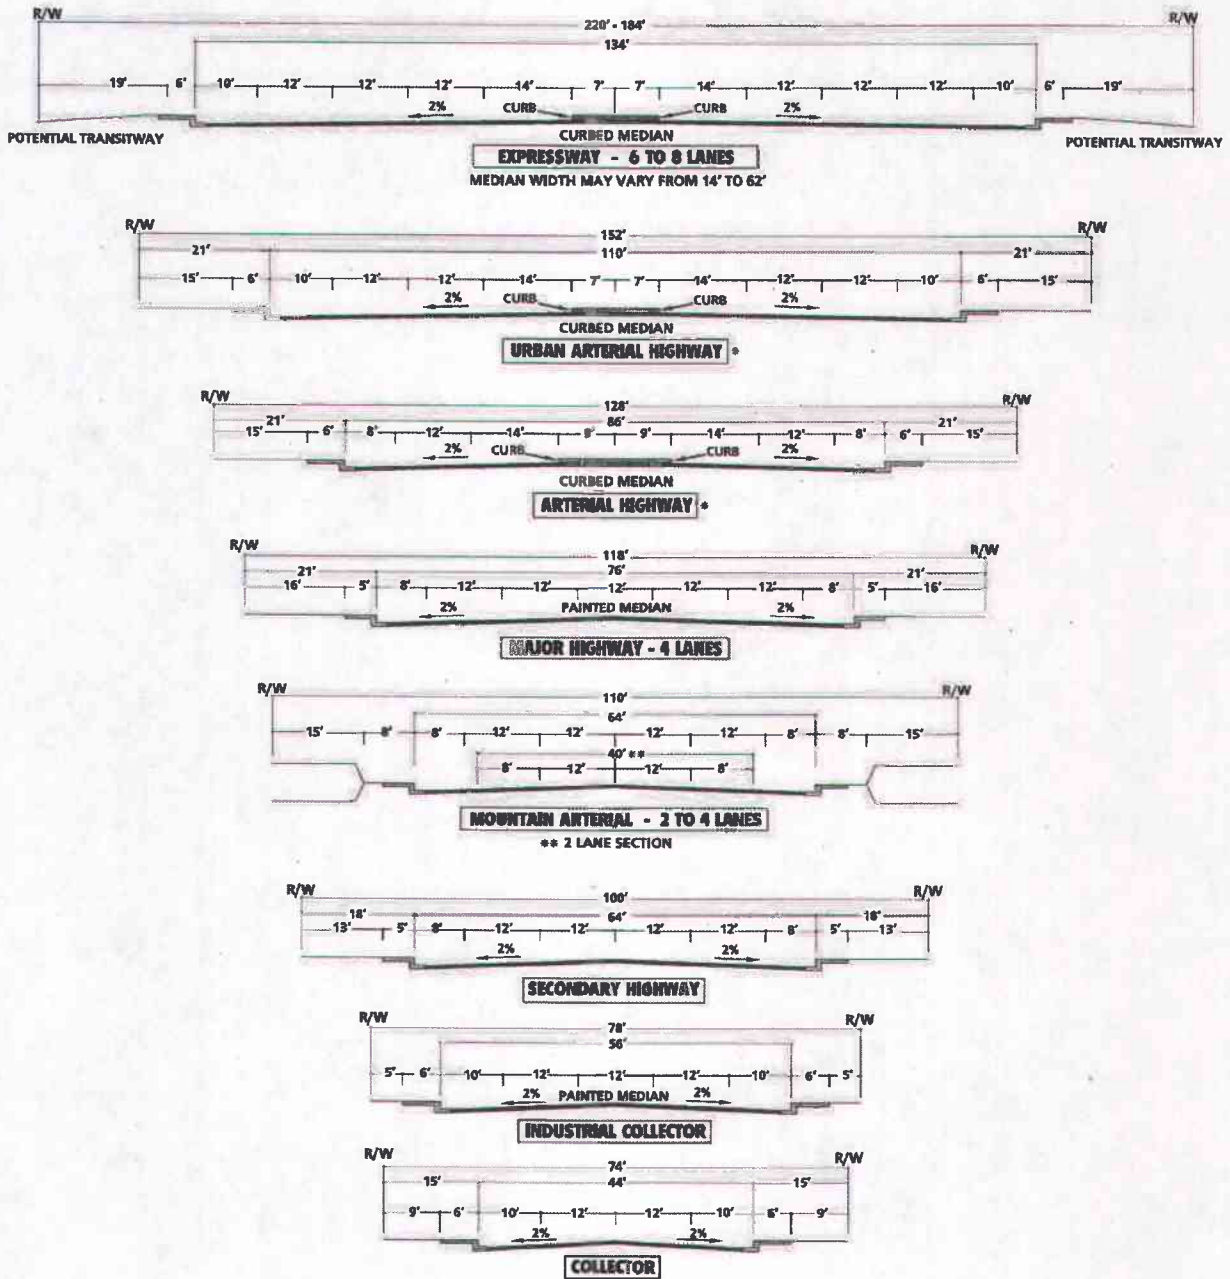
RIVERSIDE COUNTY GENERAL PLAN ROADWAY CROSS-SECTIONS
